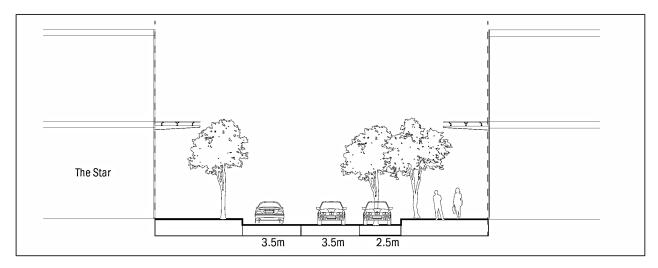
Site elevation / section 3: Edwards Street (Hassell)
